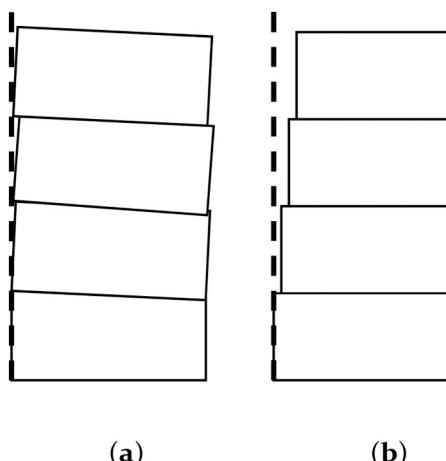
Module alignment issues [6] (a) Vertical misalignment; (b) Horizontal misalignment.
